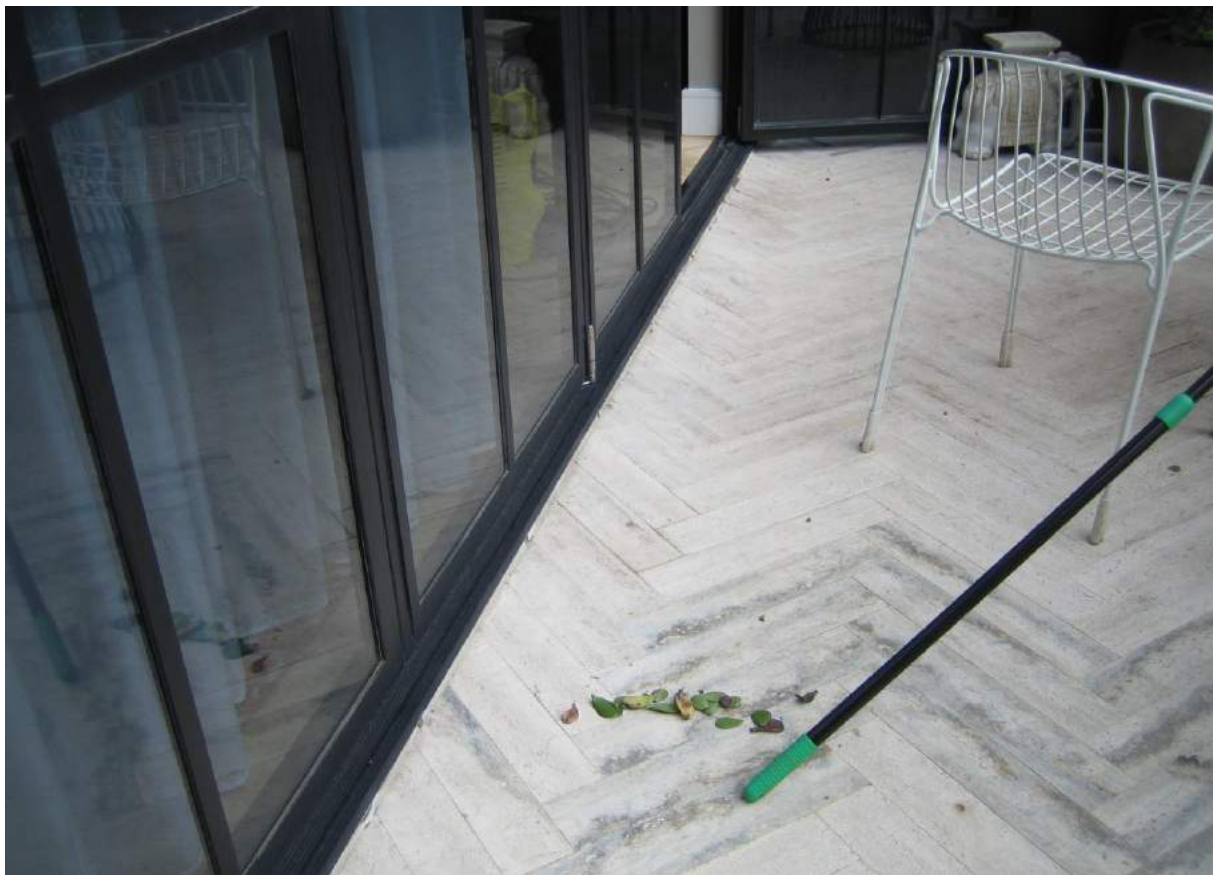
Water penetration and cracked tiles at living room balcony doors in Unit 407.
